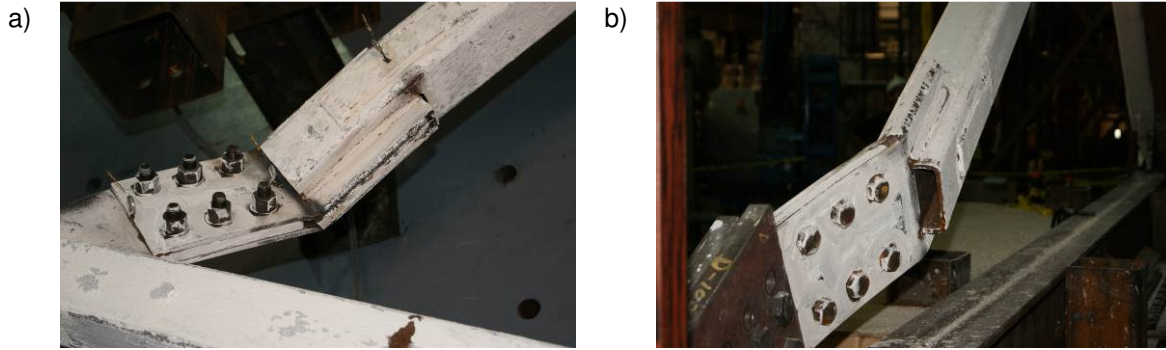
Mechanism in DS connections with continuously welded shim plates (Specimen no. 6):
